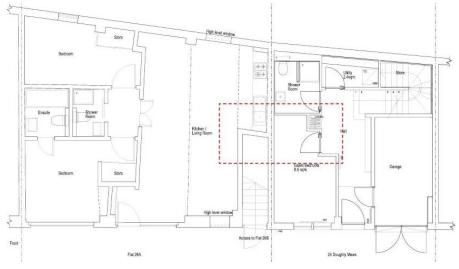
Existing Ground Floor – No 26a & No. 25
